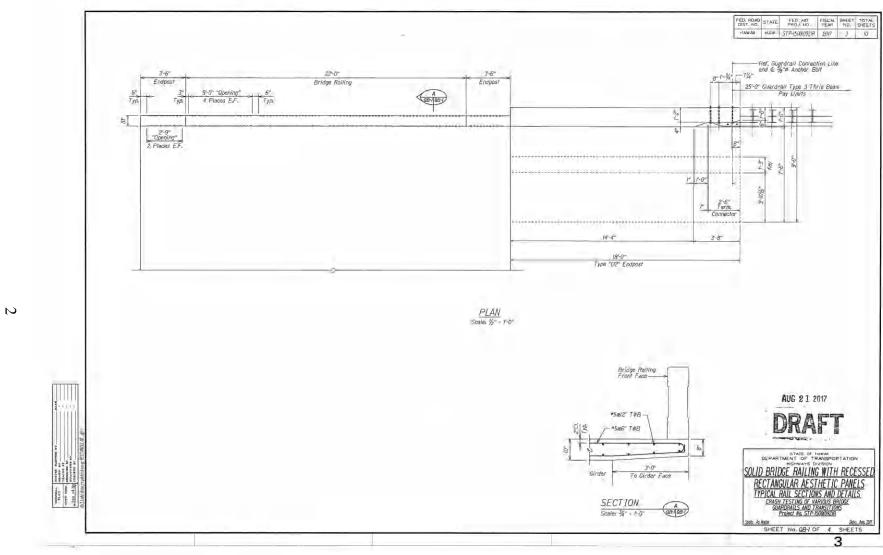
HDOT Standard Detail for the 34-in. Tall, Aesthetic Concrete Bridge Rail
